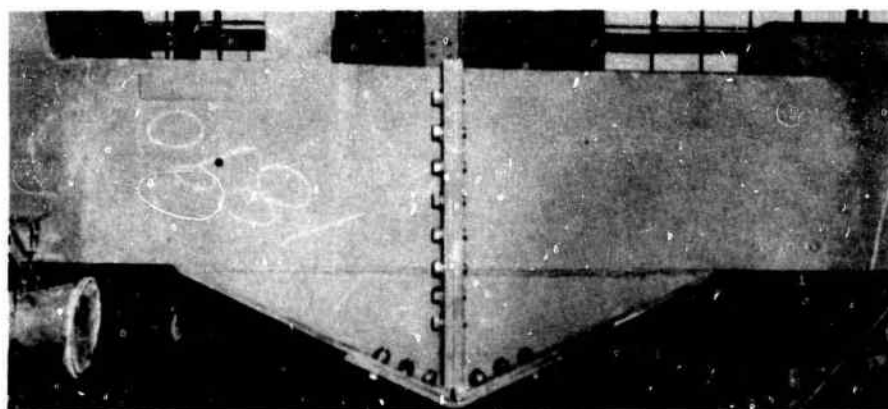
FINISHED JOINT (PRIMARY UNIT)
